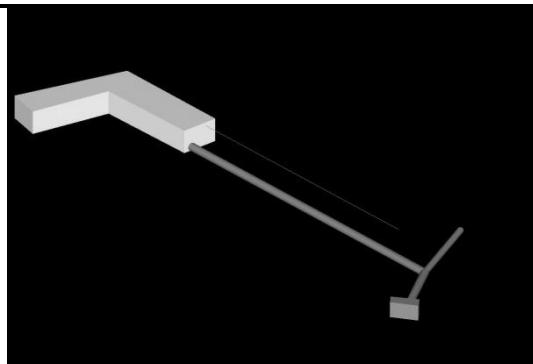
excavation trench, pipe sections, and dewatering machine
